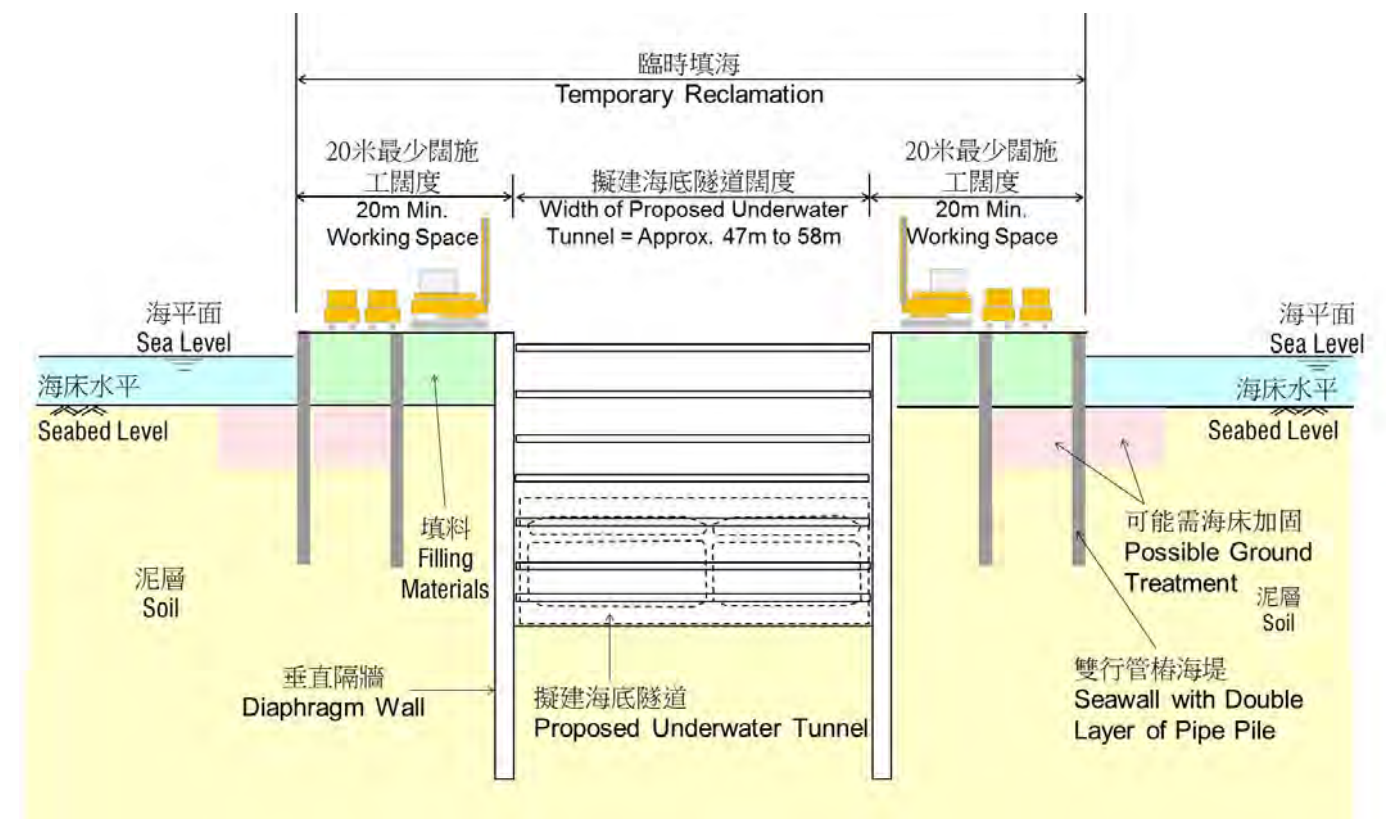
Typical Cross Section of Temporary Reclamation
